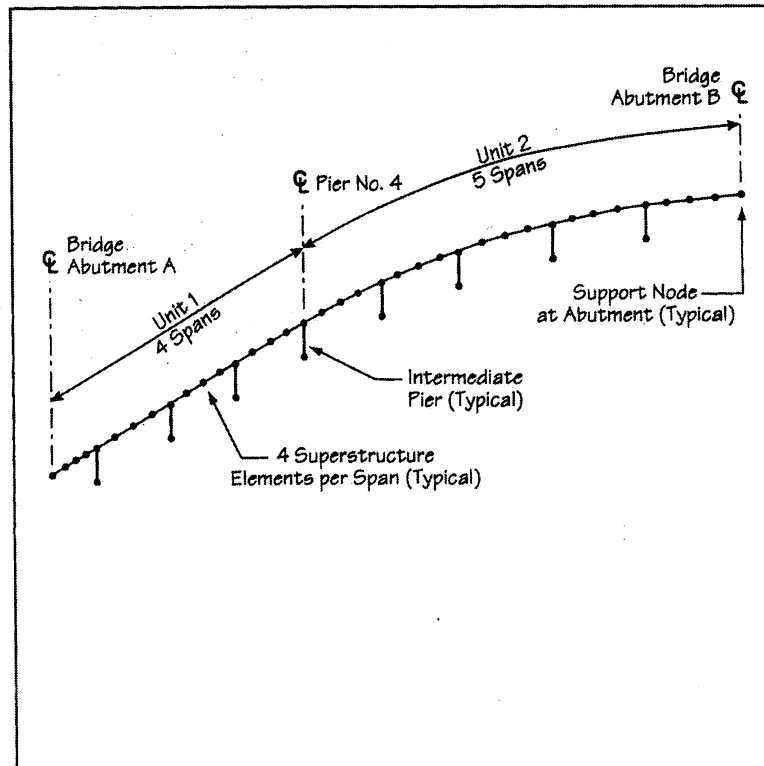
Bridge No. 5 - Finite Element Model
